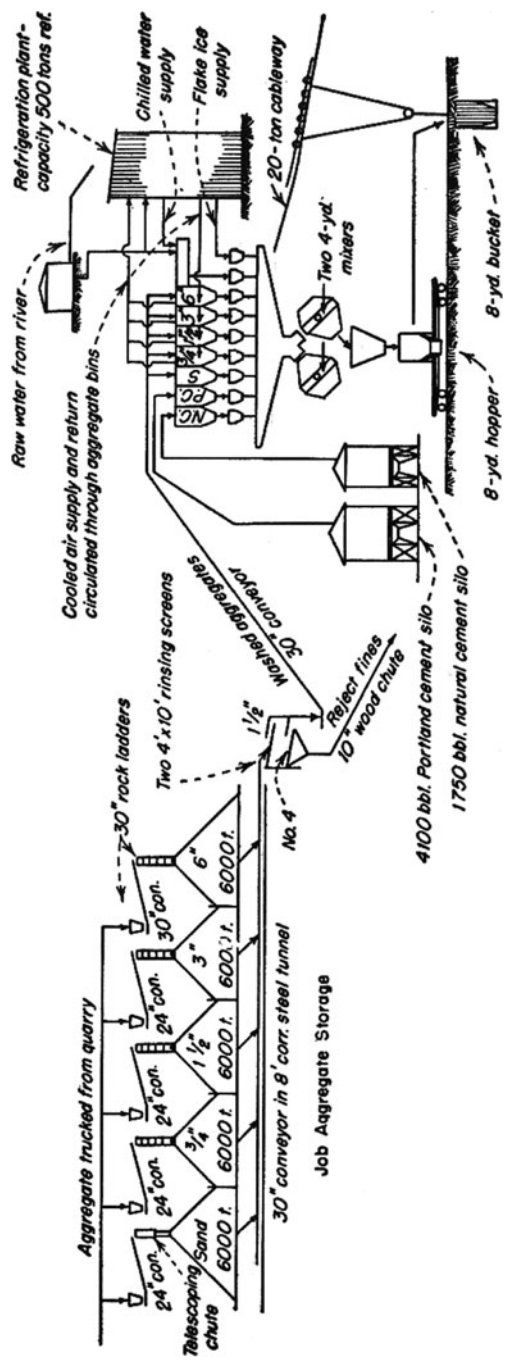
Flow diagram for the concrete mixing at the Philpott dam. (Construction Methods and Equipment)
